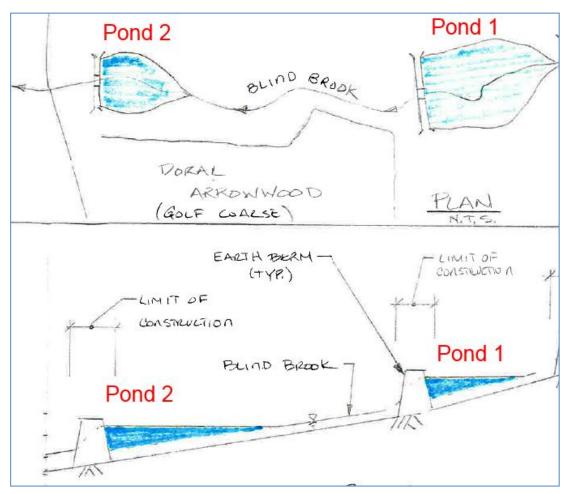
Sketch of SUNY Detention Pond 1 and Pond 2
